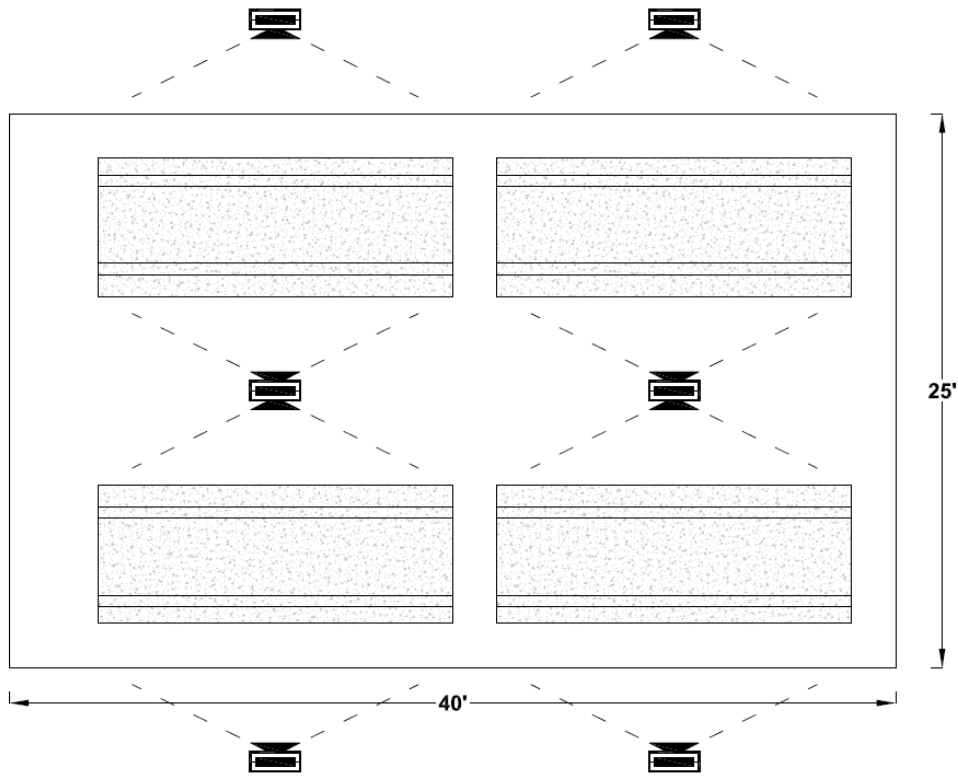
Plan View of test setup for suite 1 and 2 (pairs of specimen are identical) atop the NHERI@UC San Diego shake table
